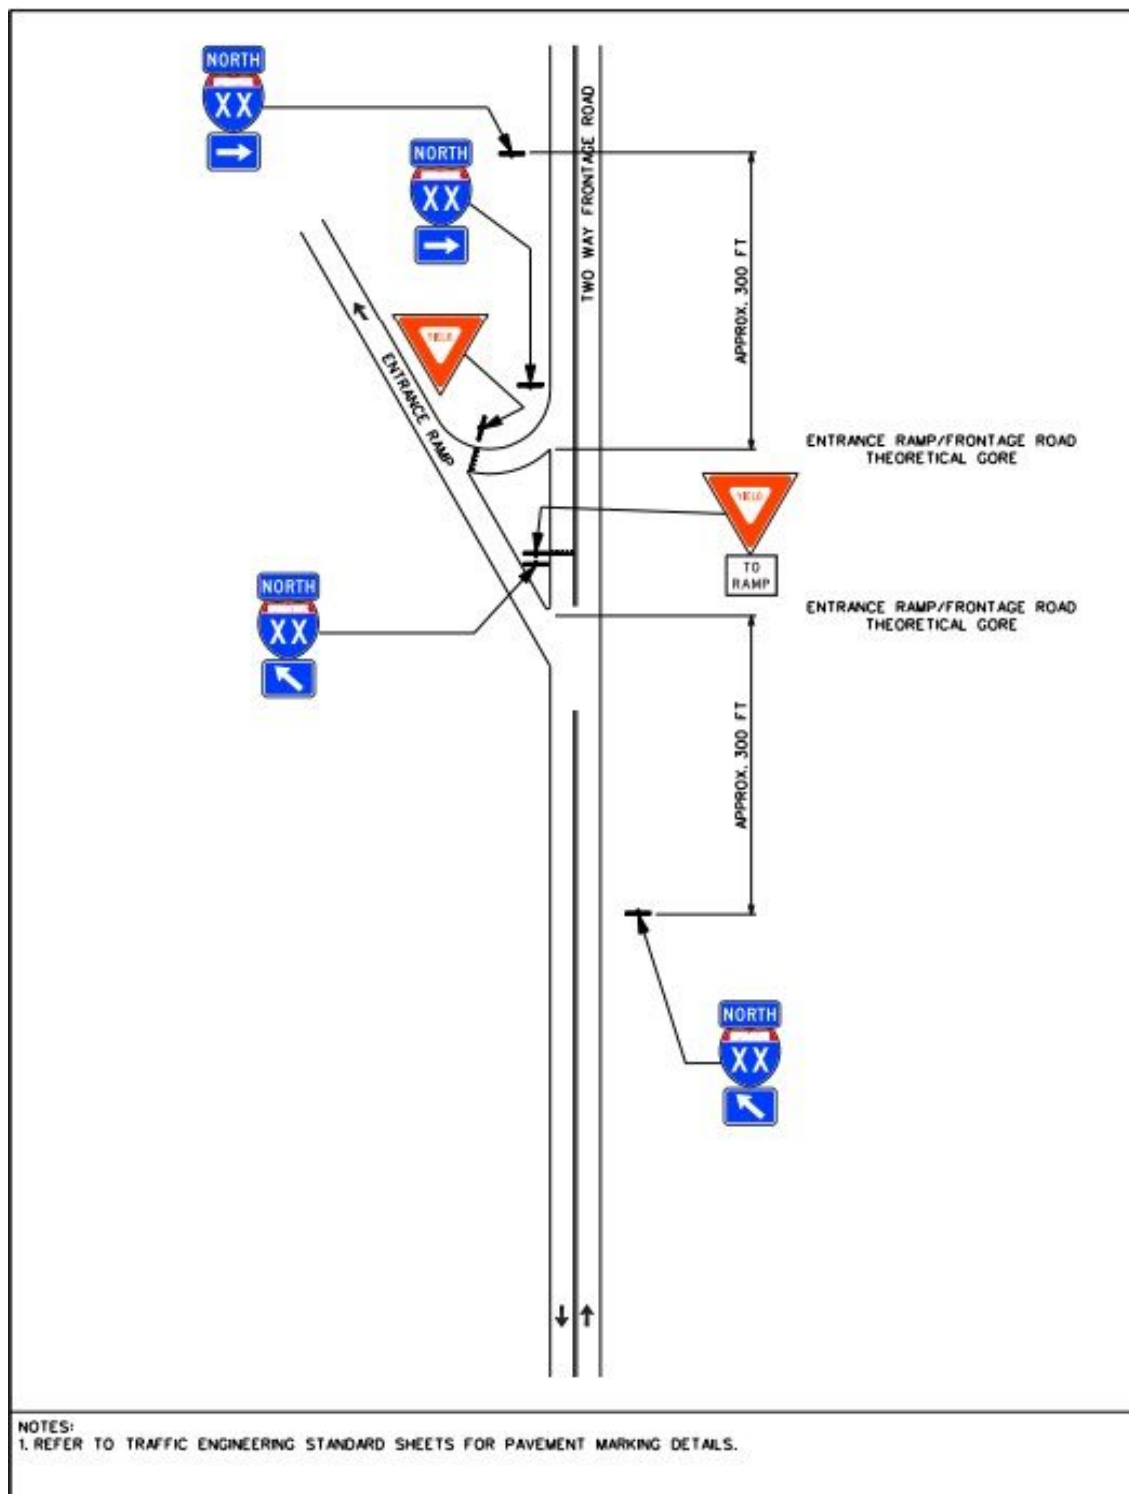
Typical signing for an entrance ramp from a two-way frontage road.
